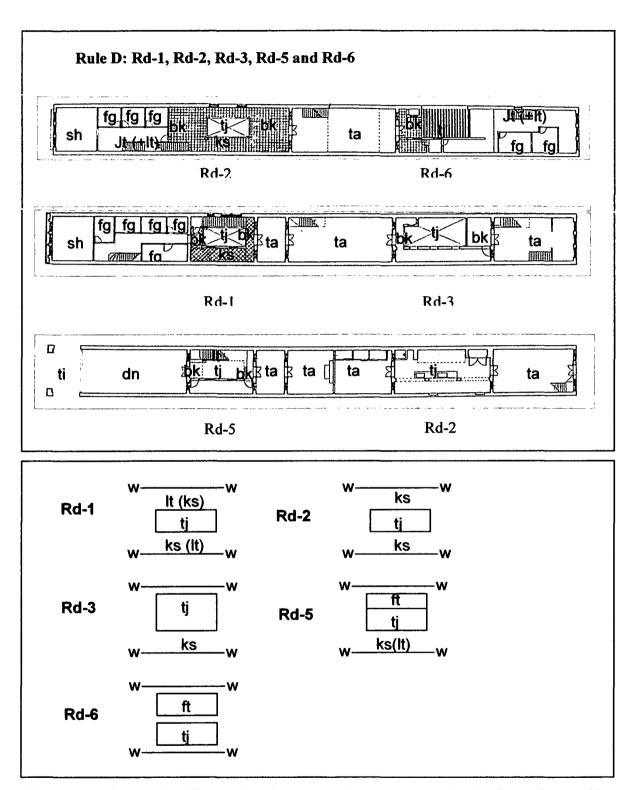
19 Rule D for illustrating the connections among blocks for floor plans at No. 71 Dihwa St
